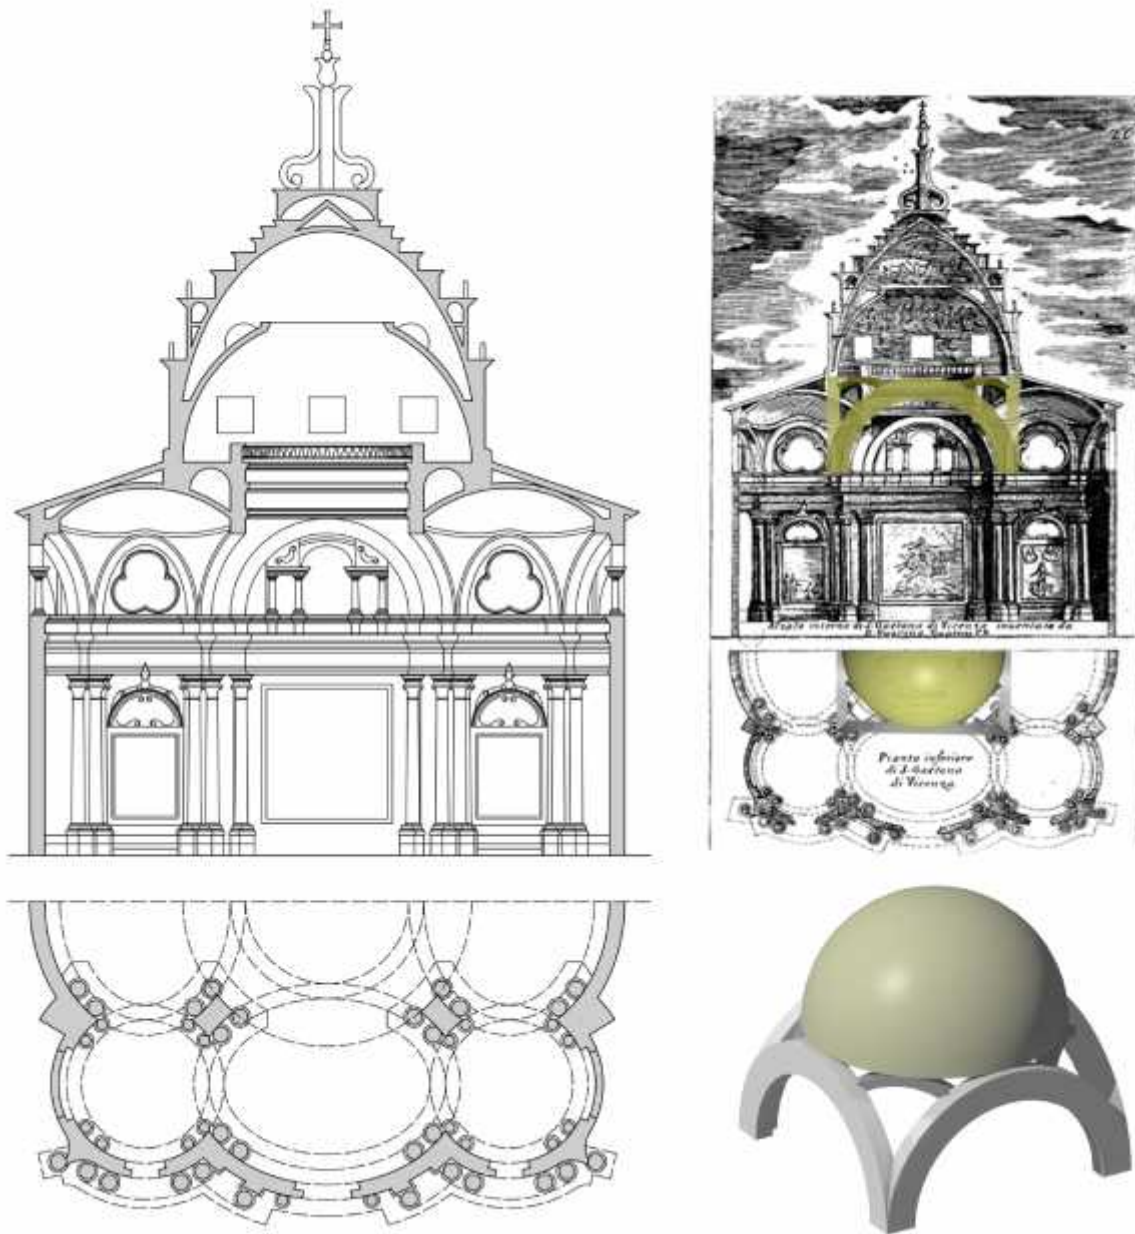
San Gaetano church: plan, cross-section and hypothesis of the hidden structure
